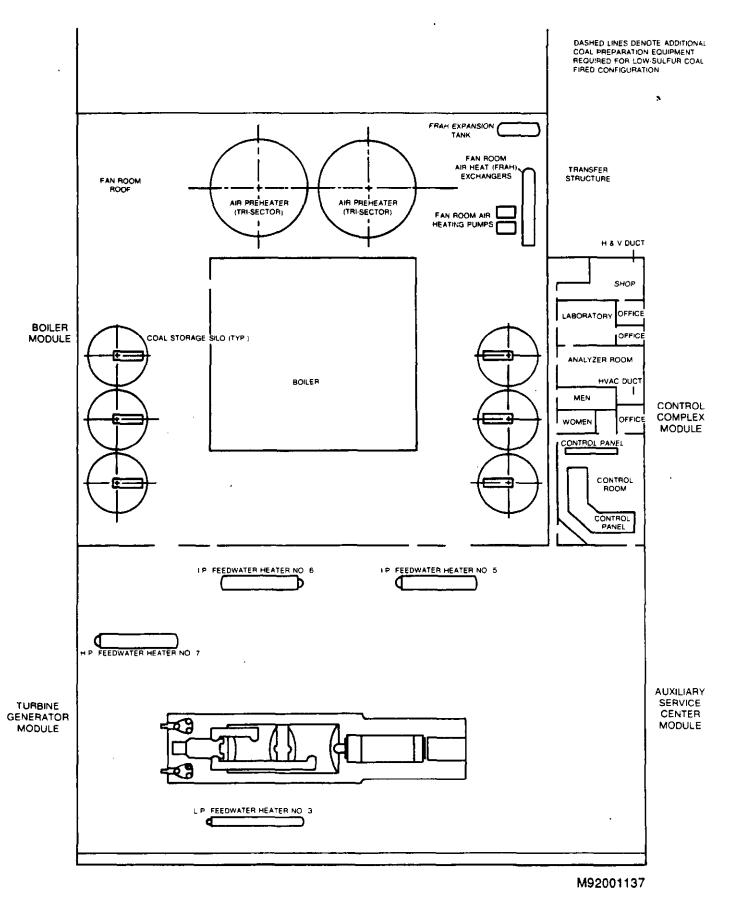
Reference Plant Arrangement Plan Operating and Feeder Floor
